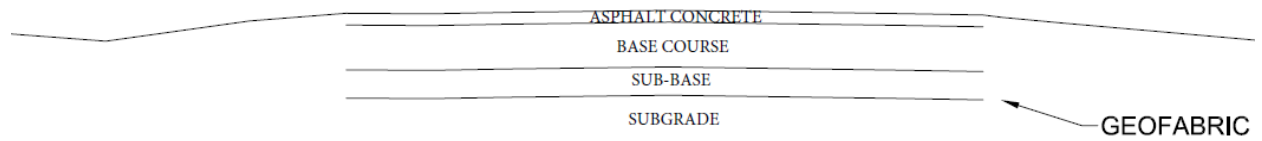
The as-built cross section of the test section FWD4-5. Horizontal scale is equal to vertical scale.
